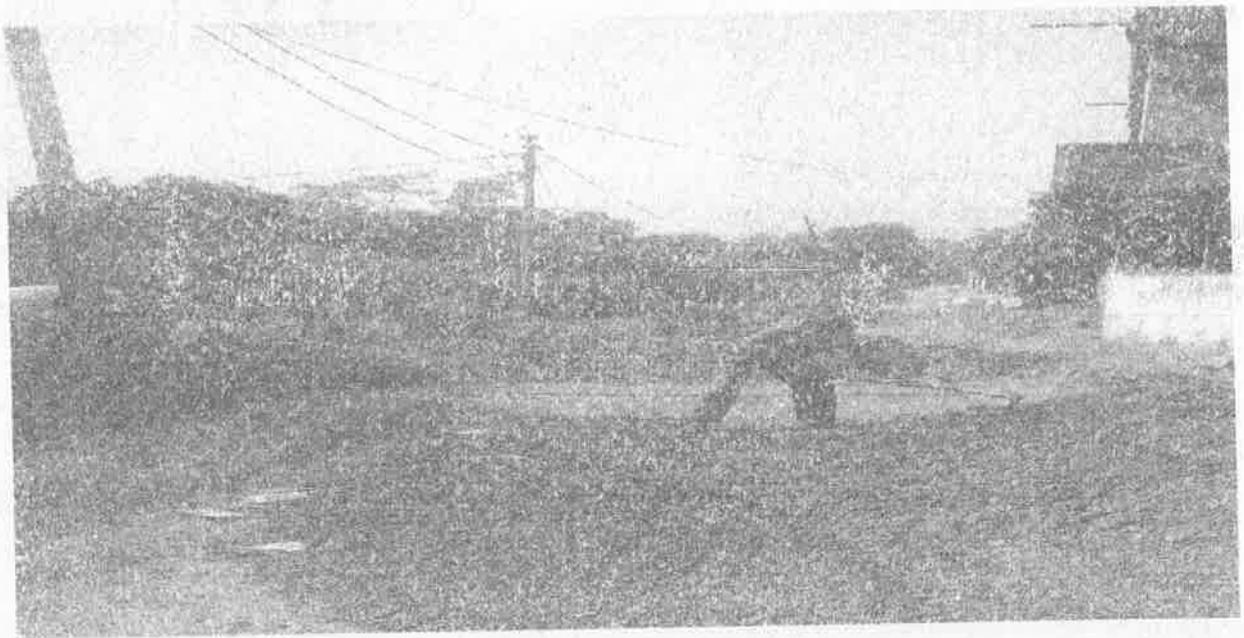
Constructed boundary wall of cremation shed at Badadarha.
